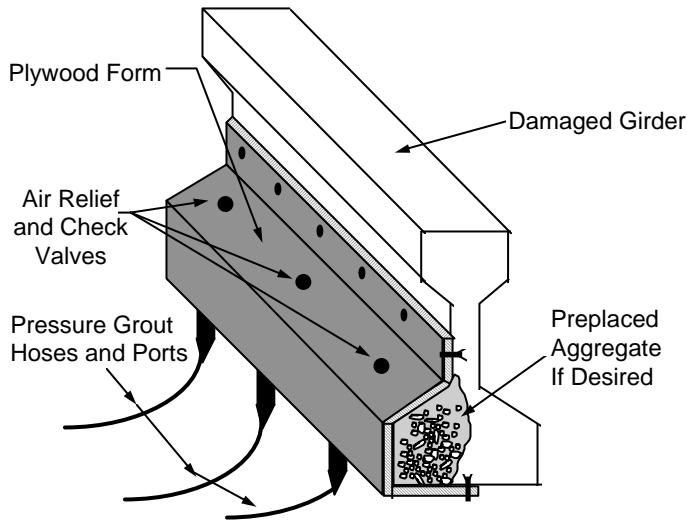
Repair of impact-damaged girder by pressure grouting with or without preplaced aggregate
